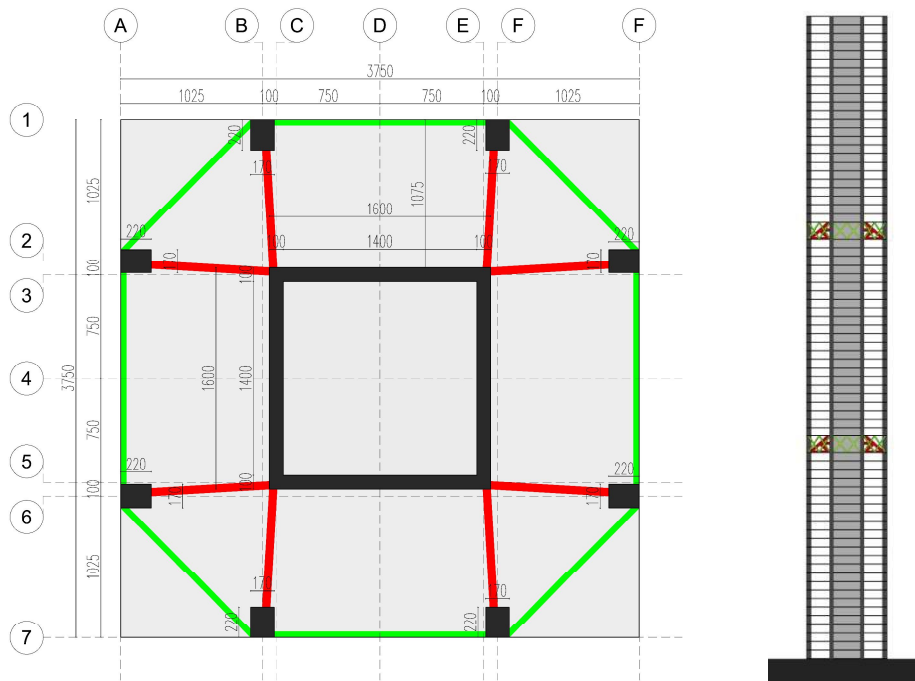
Typical floor plan and elevation of model "OF_OPT_3a" with the demonstration of outriggers and belt trusses
